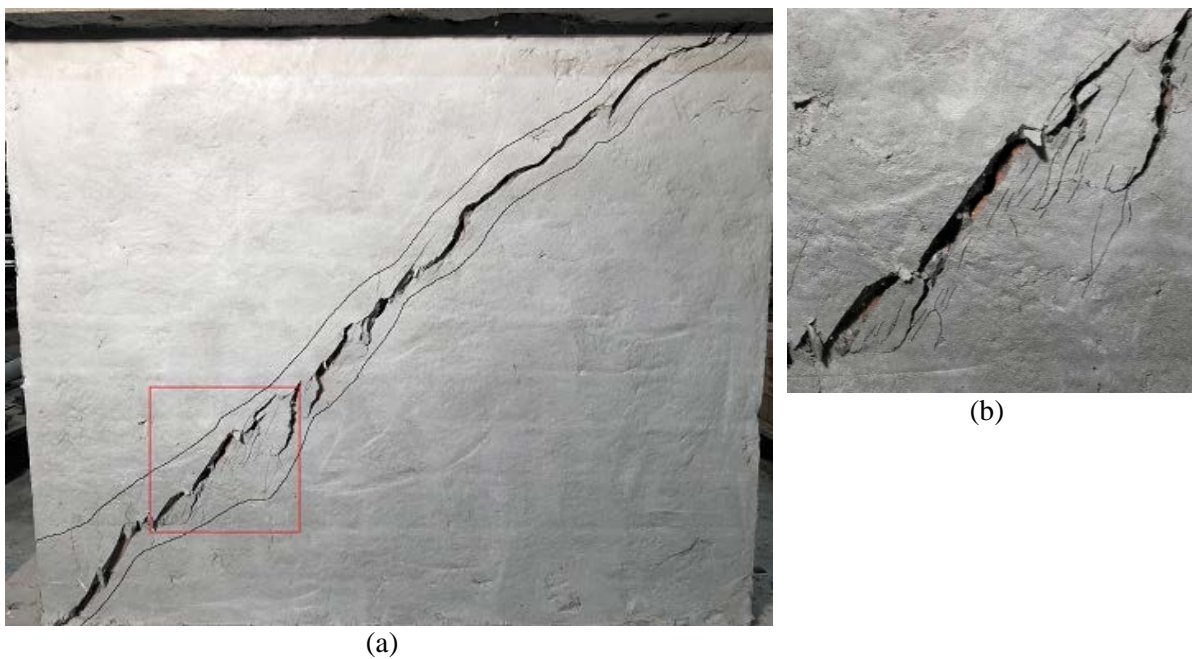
; SW-220-15-No Strips (a) localised crack with crack pattern/width outlined; (b) enlarged photograph.
